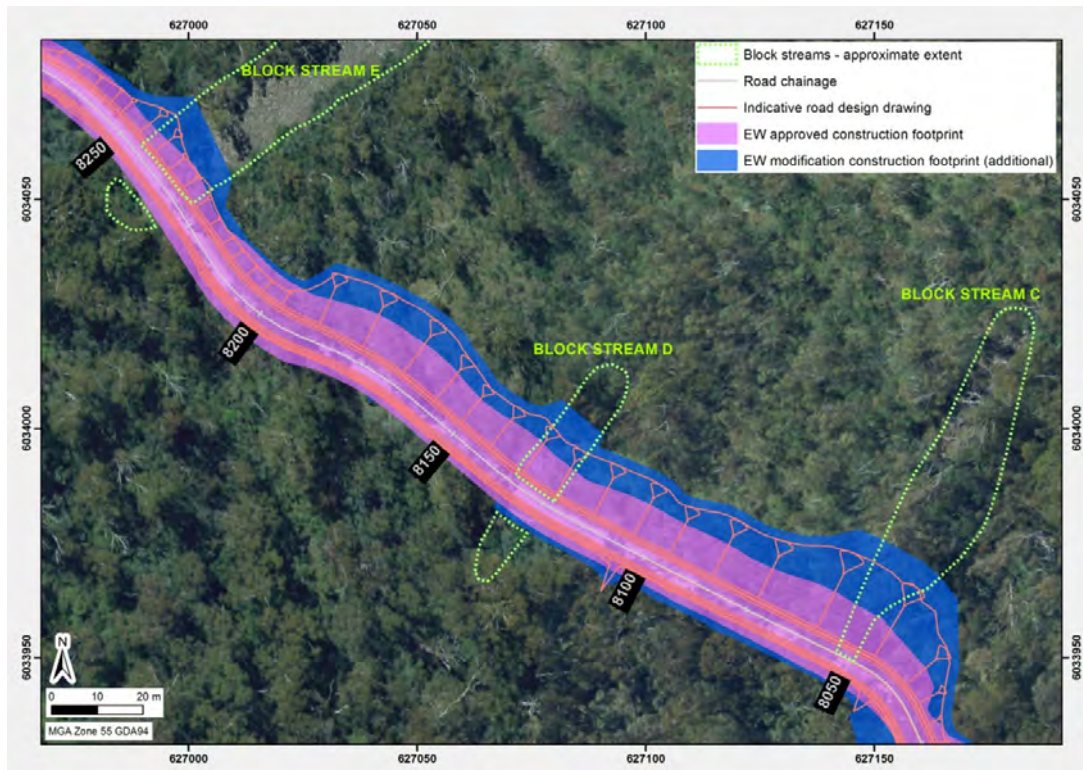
Aerial view of Block Streams C, D and E, at Lobs Hole Ravine Road, showing the extent of the proposed additional construction footprint and the indicative road design drawing for this section.
